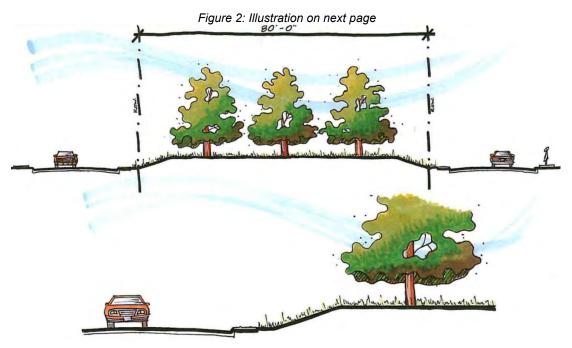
Street Buffer Strip Elevation and Street Cross-Section Elevations.
